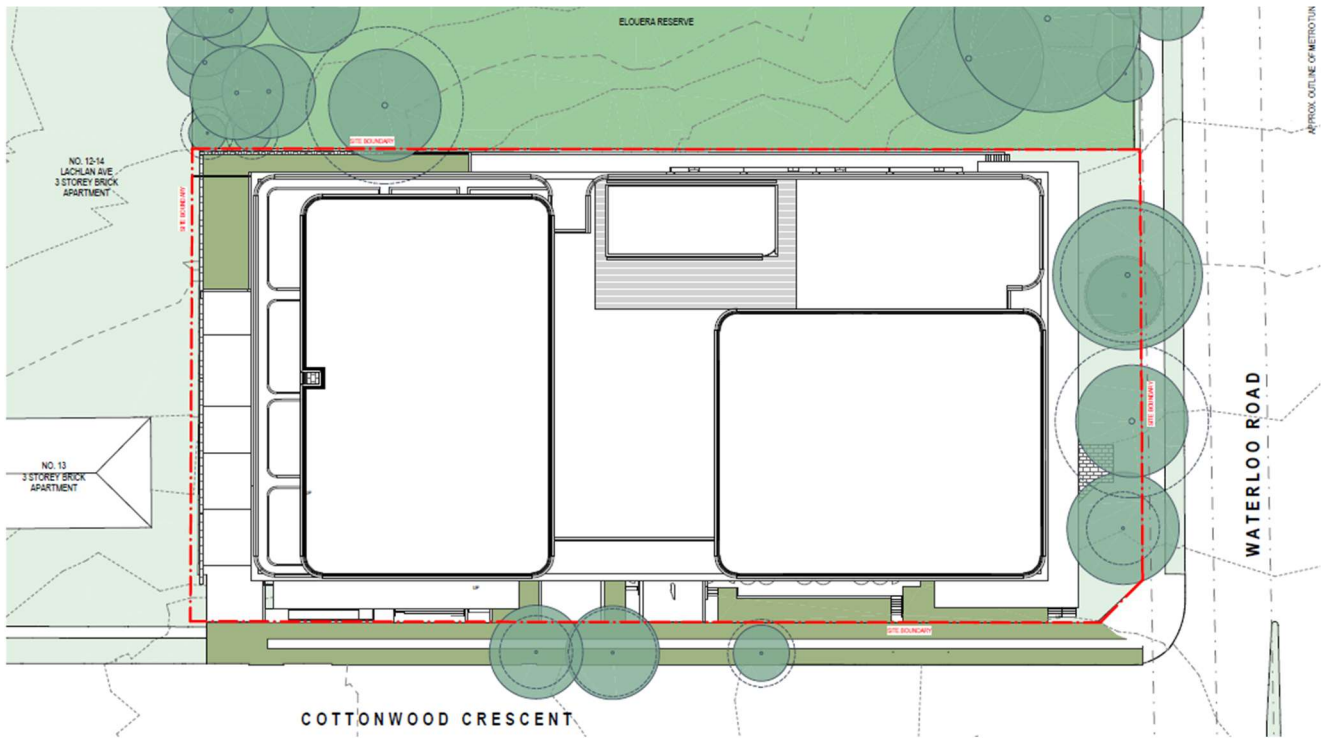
Extract of proposed plans: Site Plan (DA1002).
